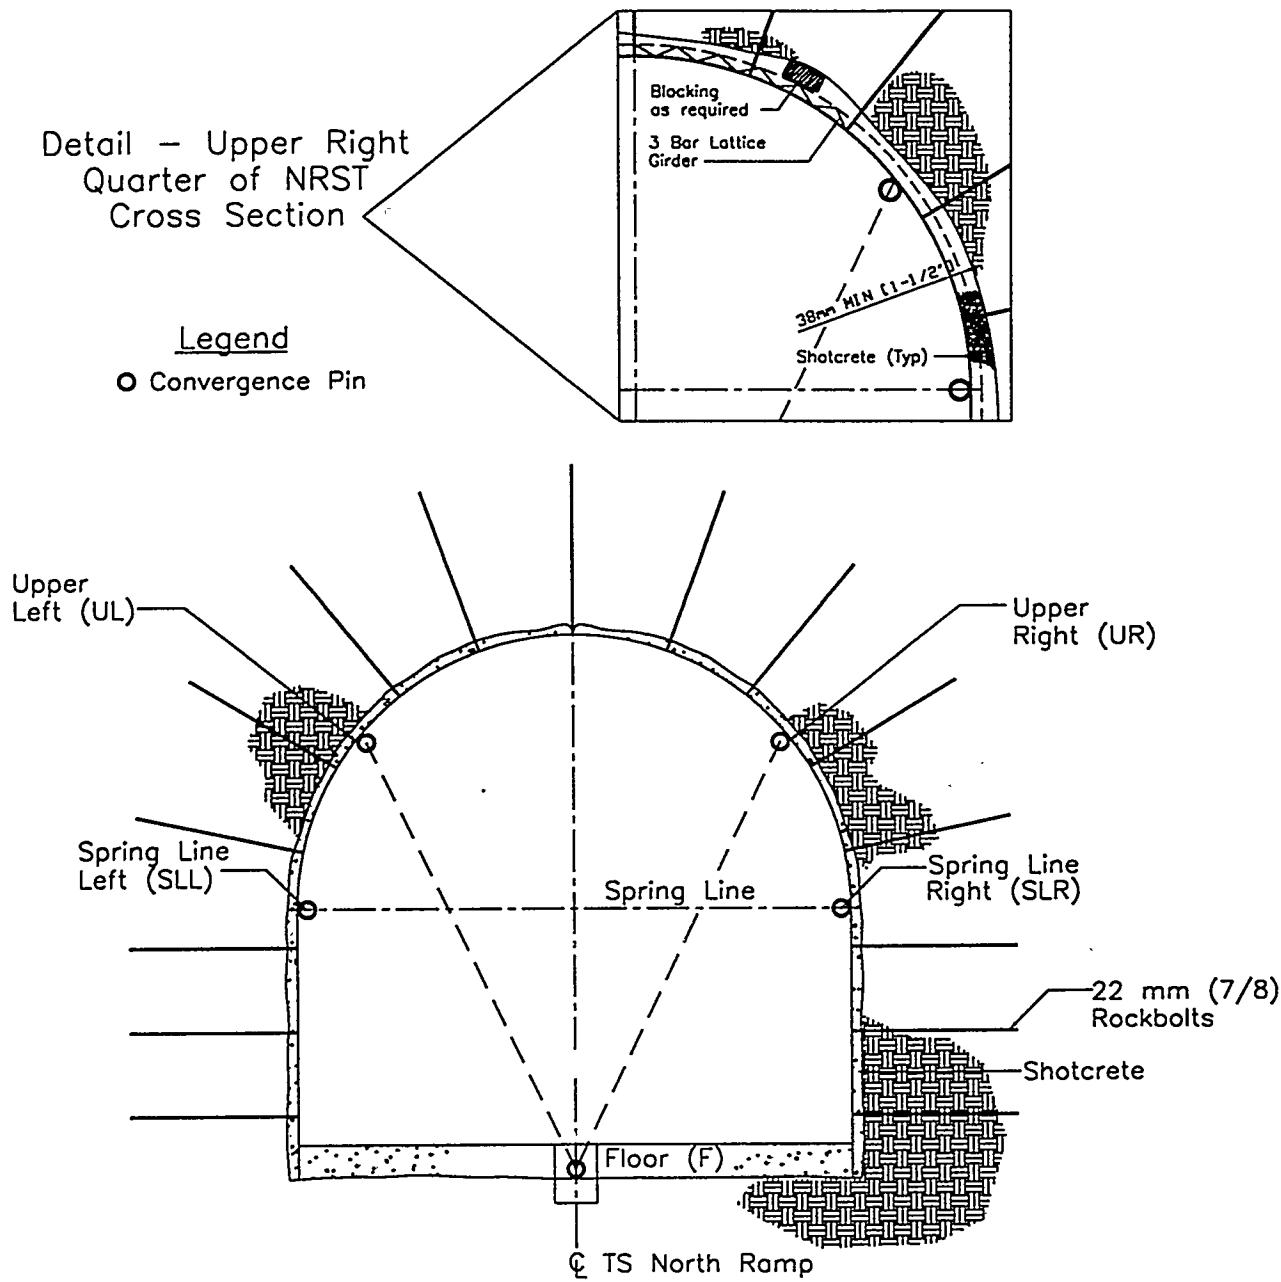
Generalized cross section of NRST convergence points installed on lattice girders, looking northwest (from ESF Package 1A, YMP-025-1-MING-MG152 Rev 1 and YMP-025-1-MING-MG153 Rev 1).
